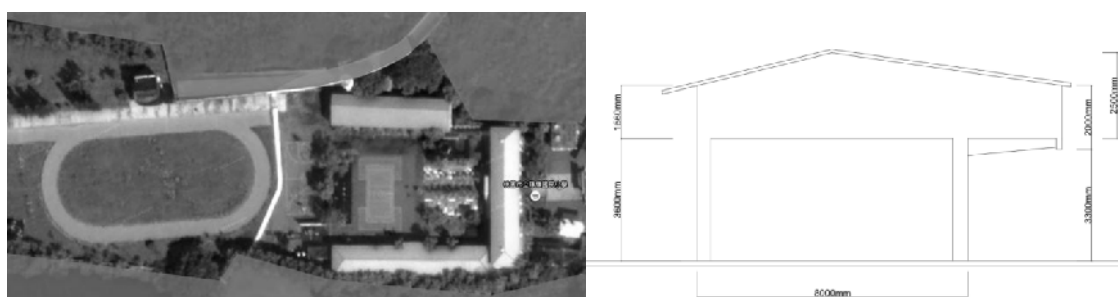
site photo (source: google map:2017/03/12); Fig.9: schematic view of the elevation of Building B
